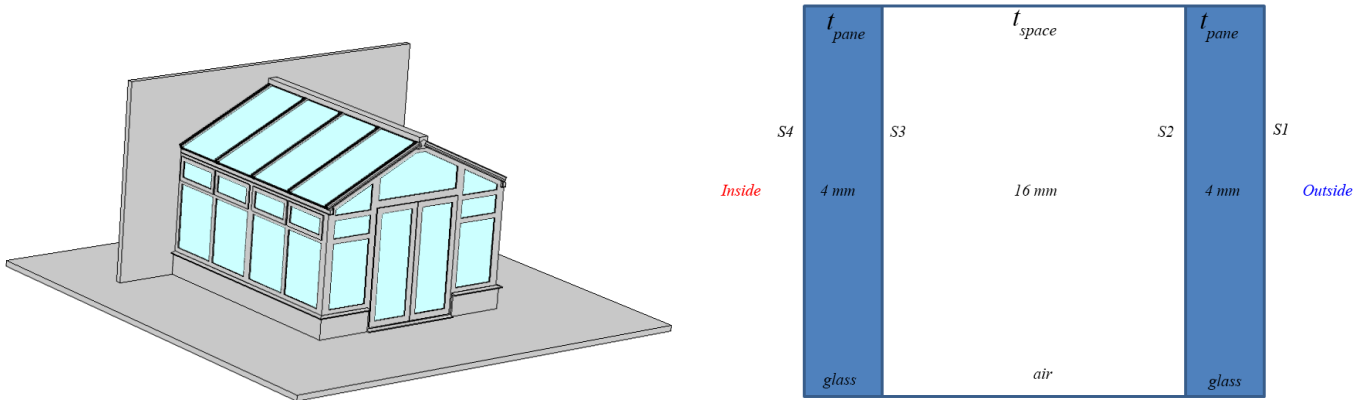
Case 2 conservatory installation with clear glazing to roof and walls.
